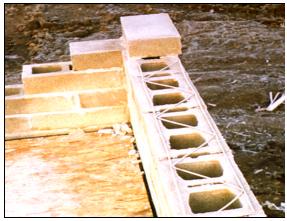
Horizontal Truss-Type Joint Reinforcement at Ohio Site
